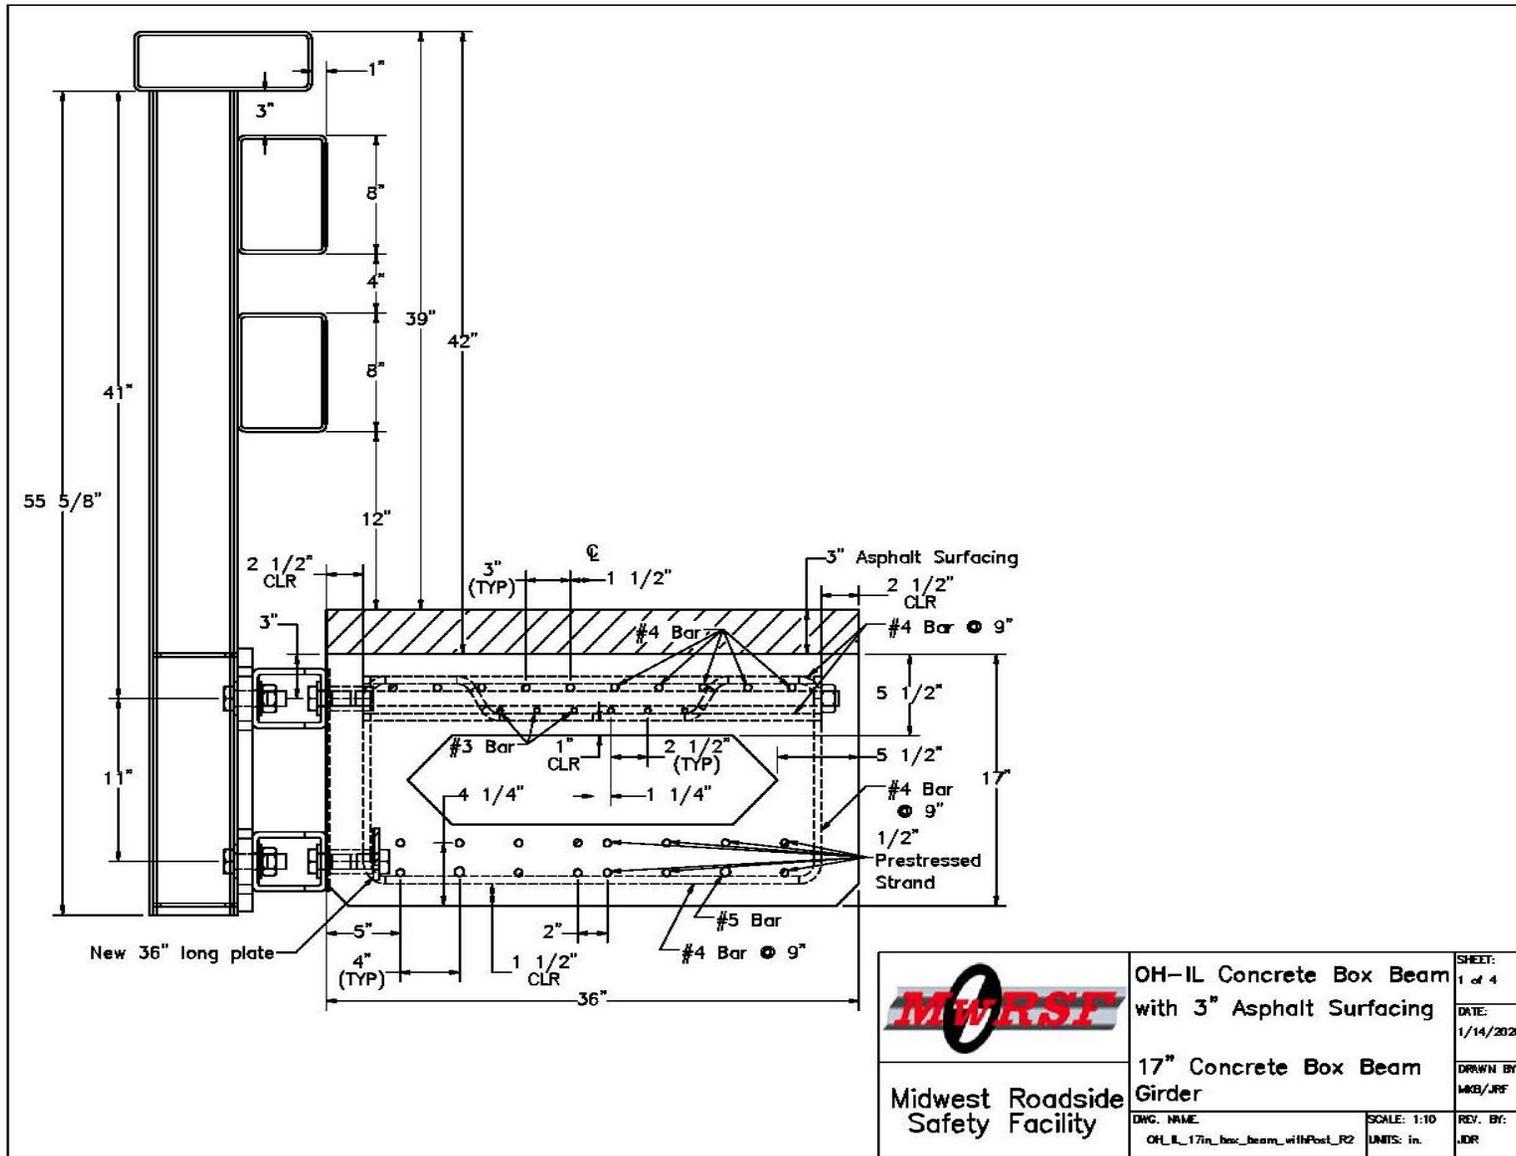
Typical 17-in. (432-mm) Deep Concrete Box-Beam Girder with Asphalt Wearing Surface
